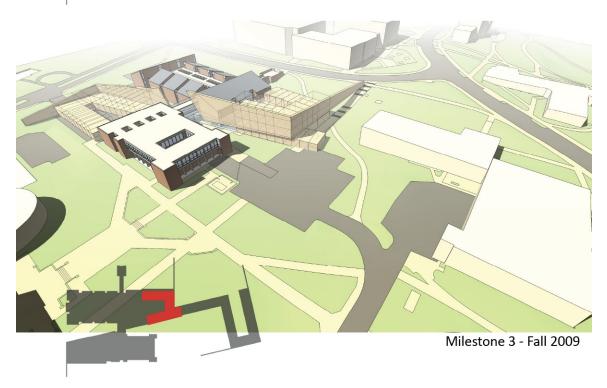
Meeting 1 - Scheme B - Renovations and Additions
